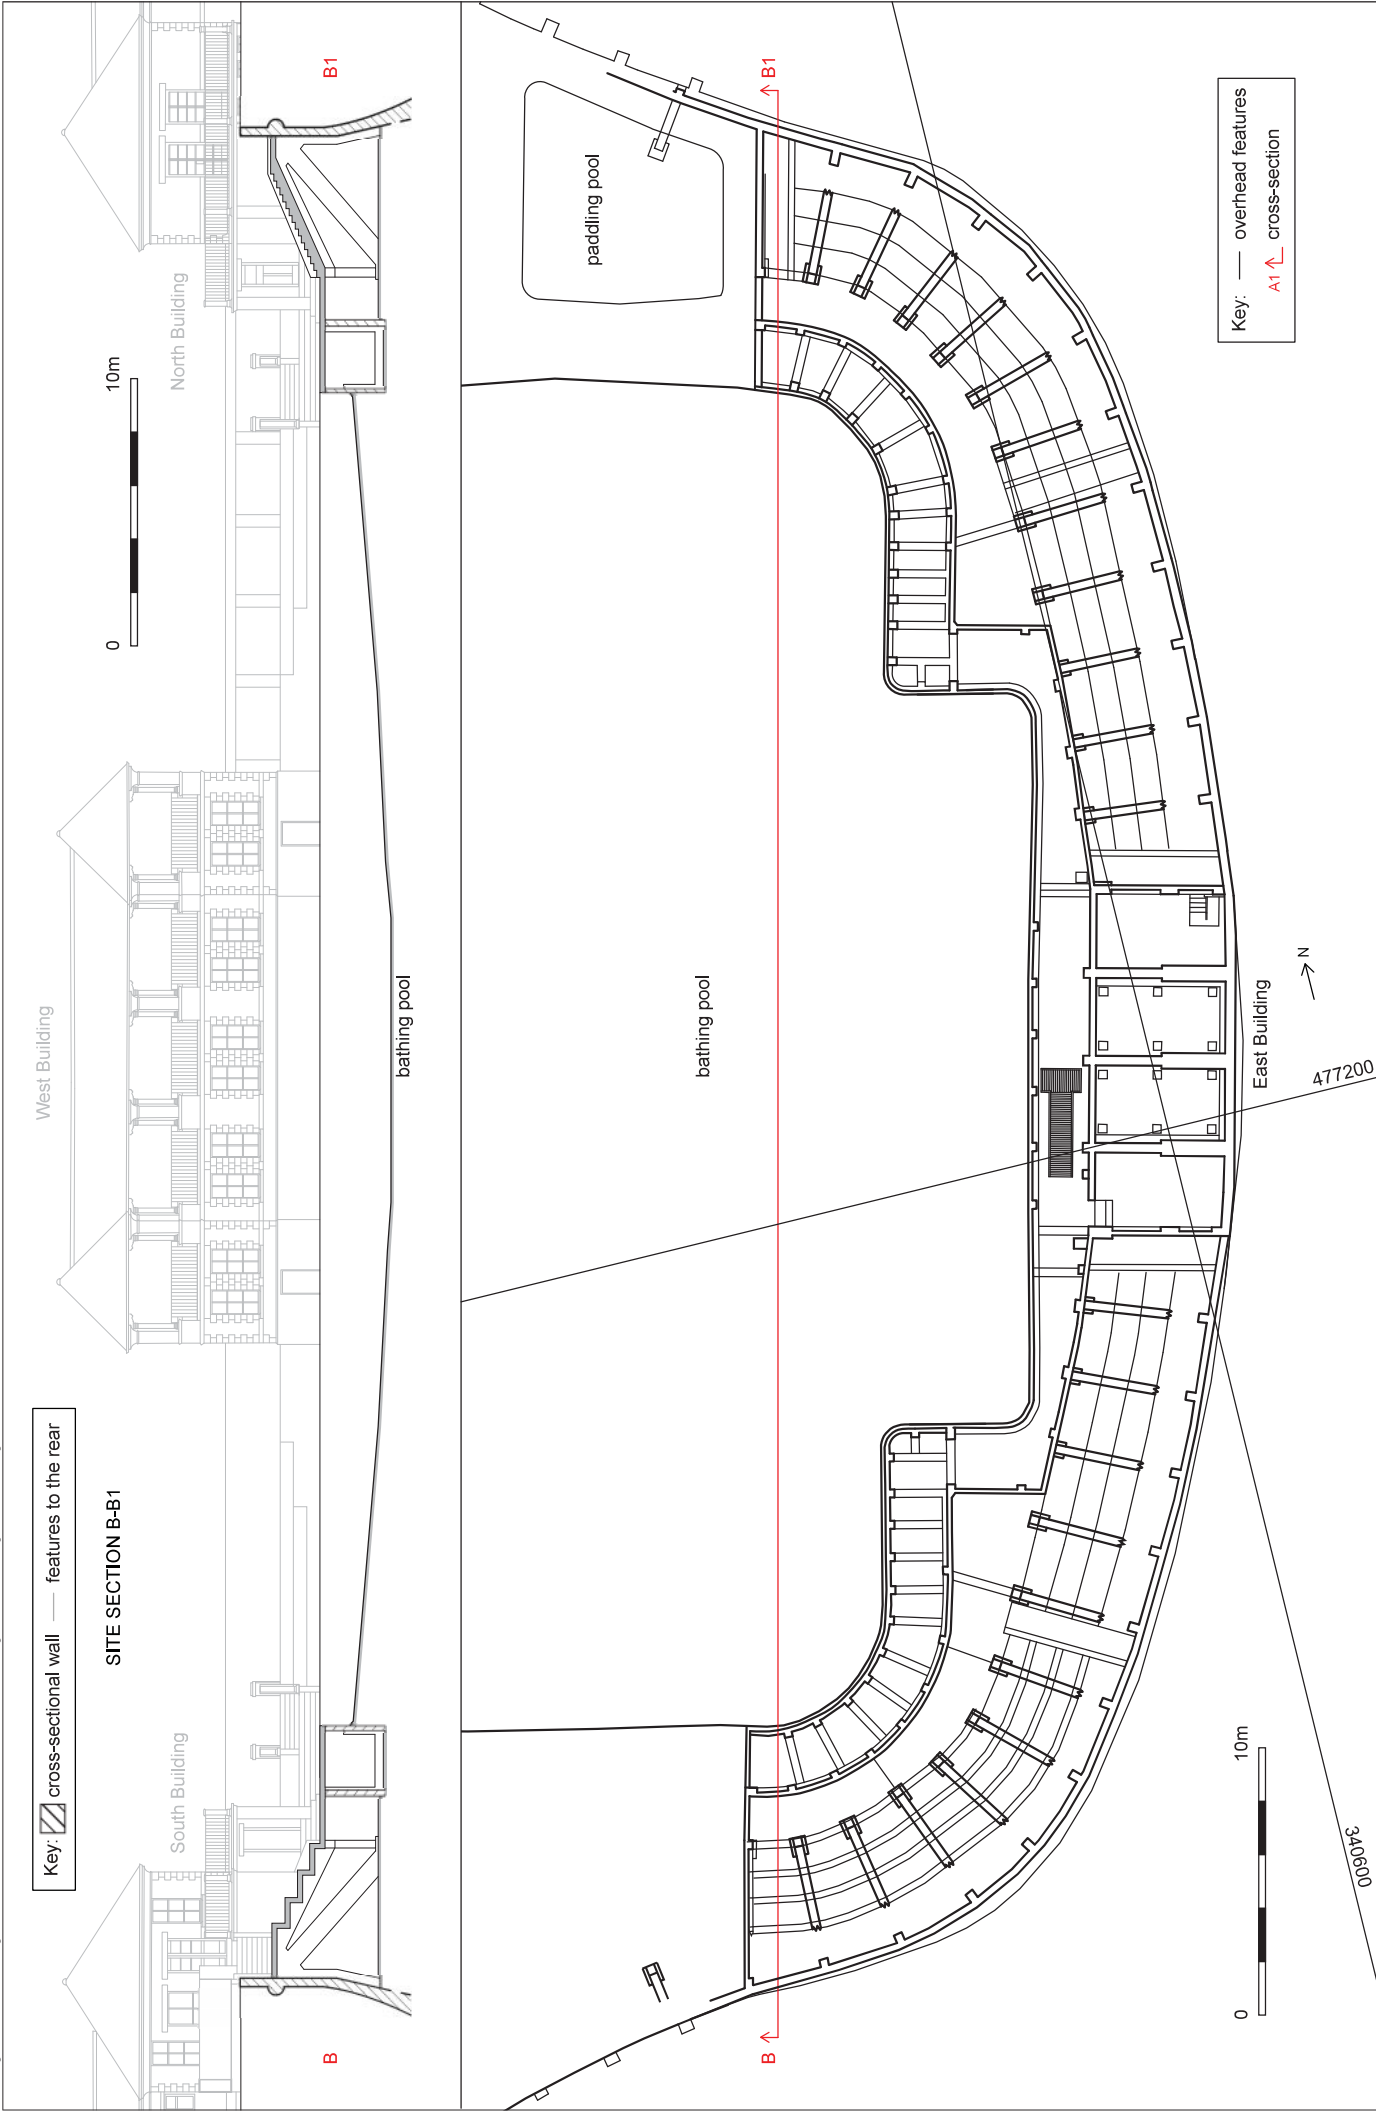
Plan of the lower level features to the east side of the site and site section B-B1
